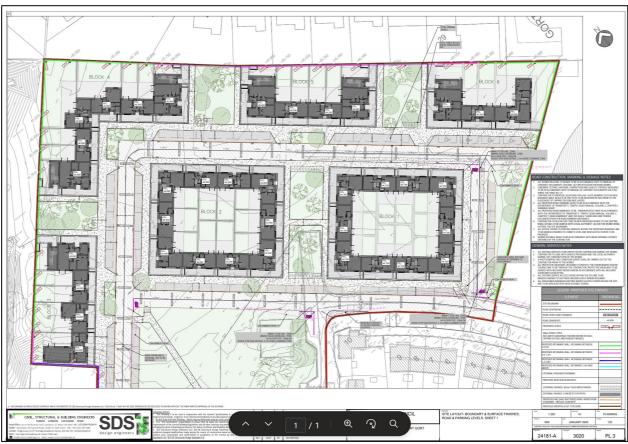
Site Layout Plan (Source: SDS Design Engineers)
